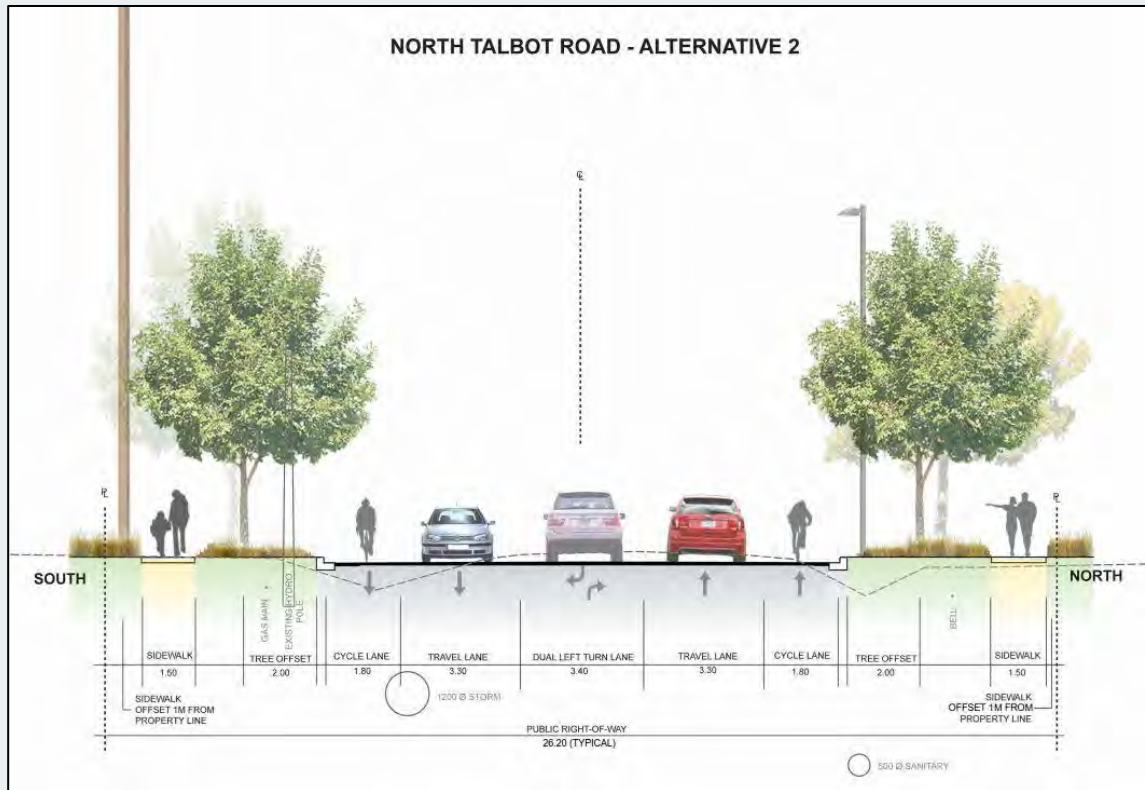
ALTERNATIVE 2 – NORTH TALBOT ROAD
